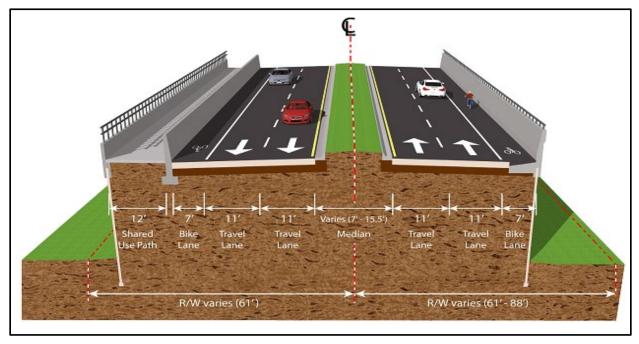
Four-lane Elevated Typical Section along Overpass Road
